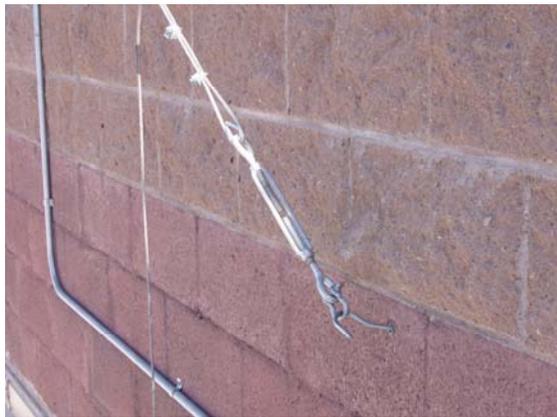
Roof Installation Procedure (Steps 2-4)
